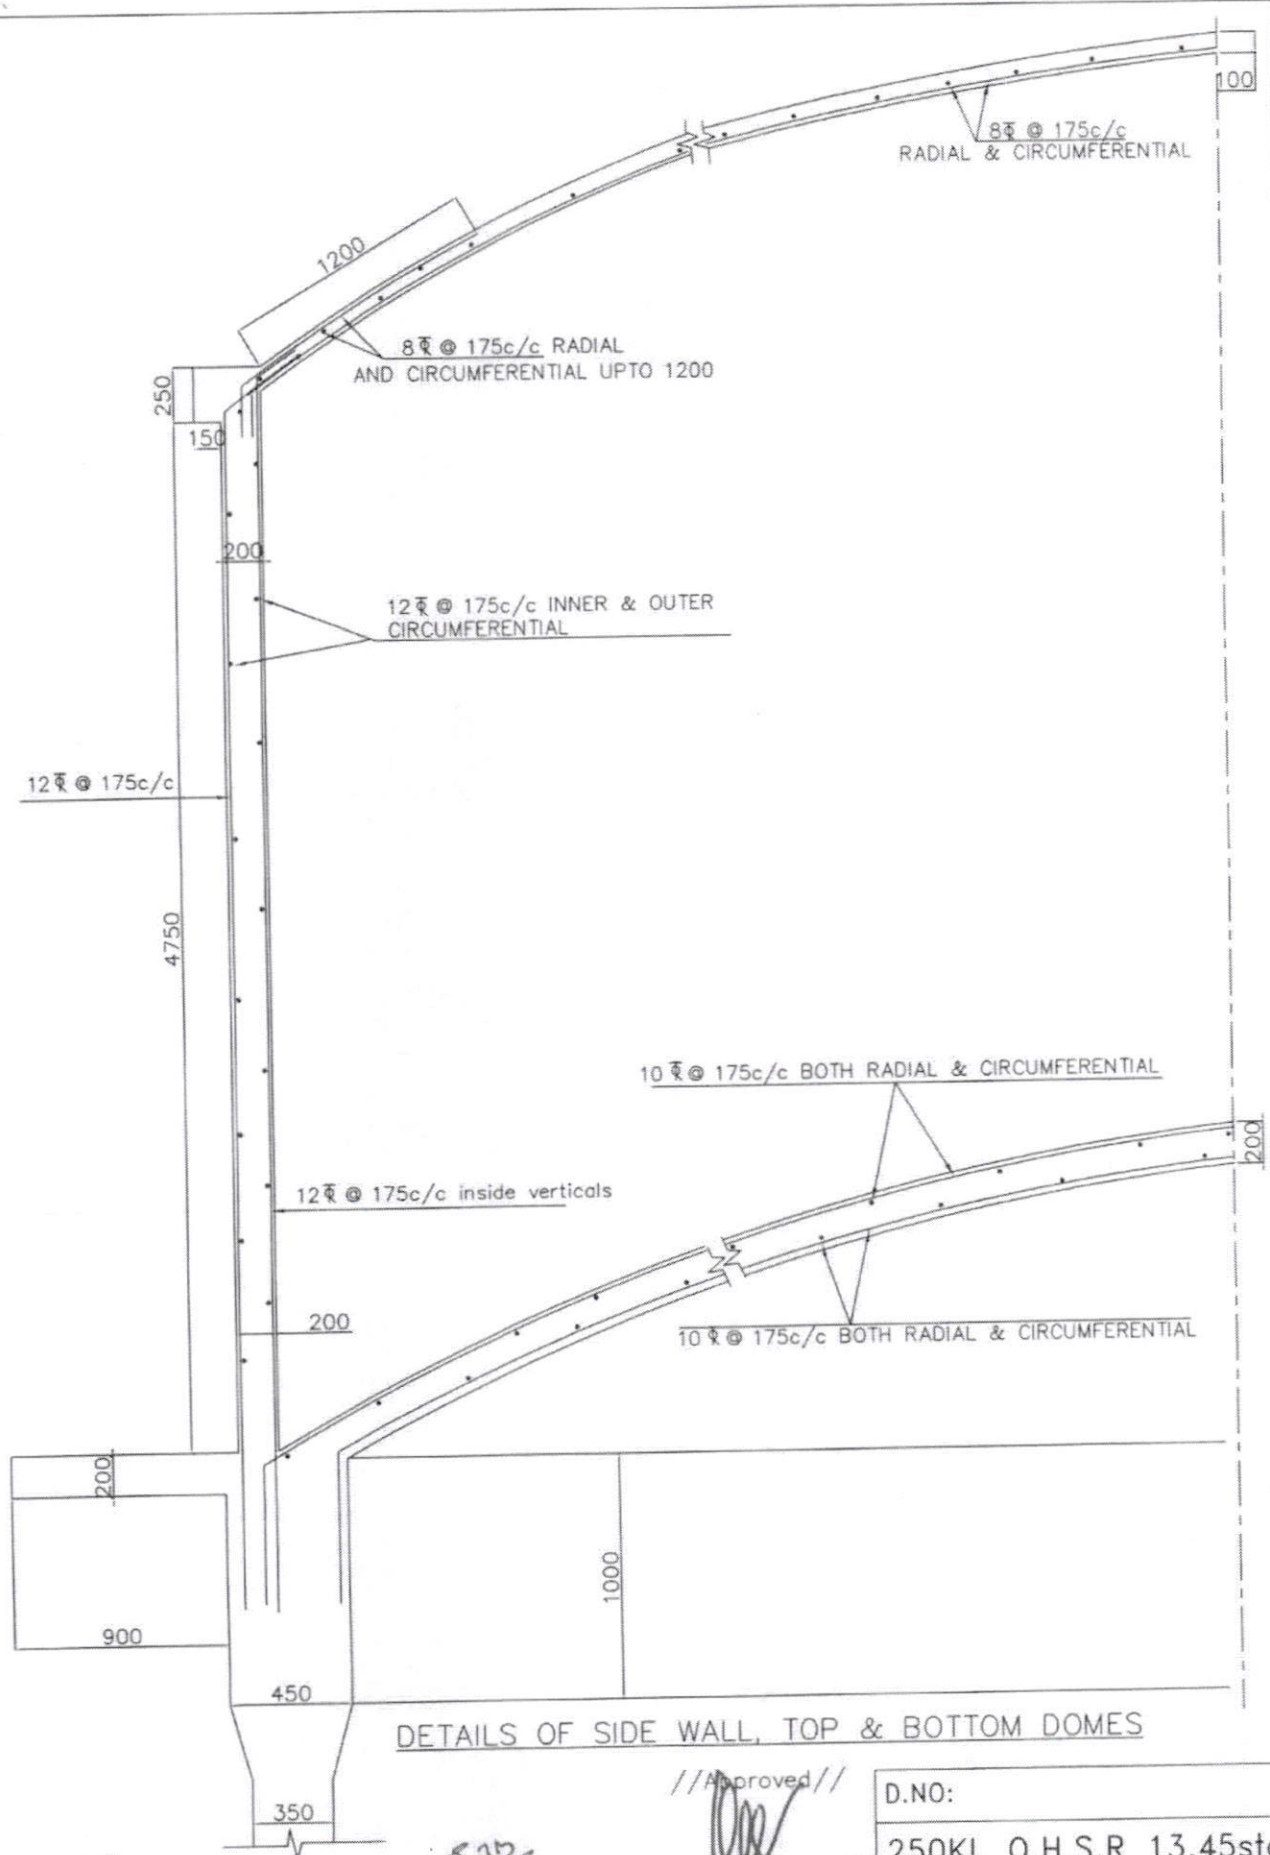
DETAILS OF SIDE WALL, TOP & BOTTOM DOMES
